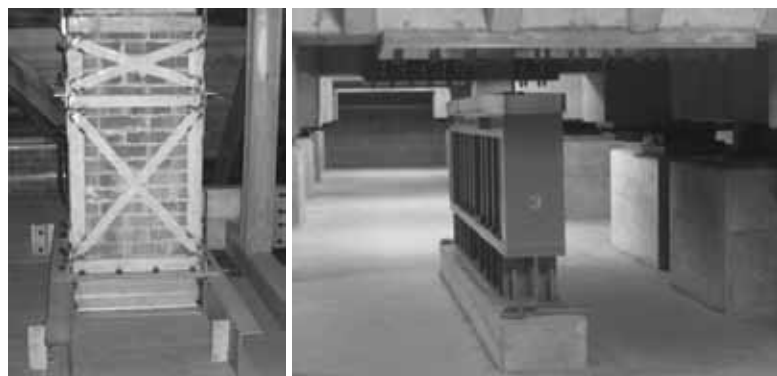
Left. Chimney bracket to prevent it from falling in a European style house;
